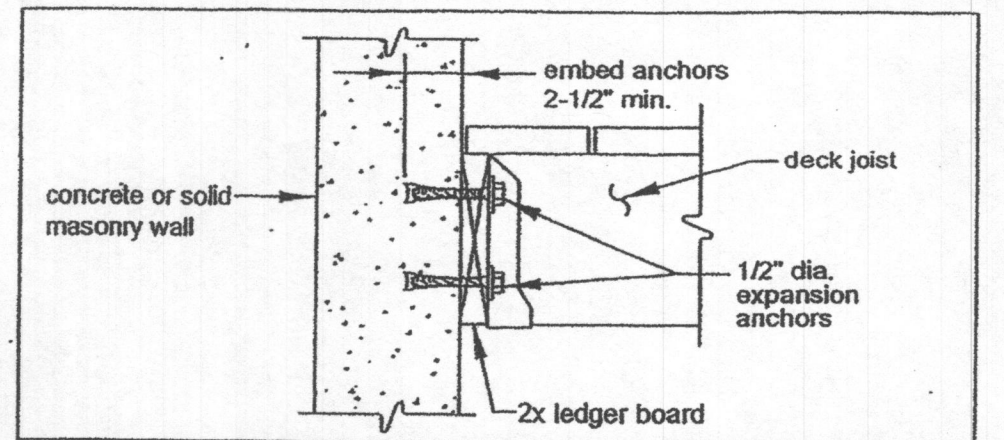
ATTACHMENT OF LEDGER BOARD-TO-FOUNDATION WALL (CONCRETE OR SOLID MASONRY)
